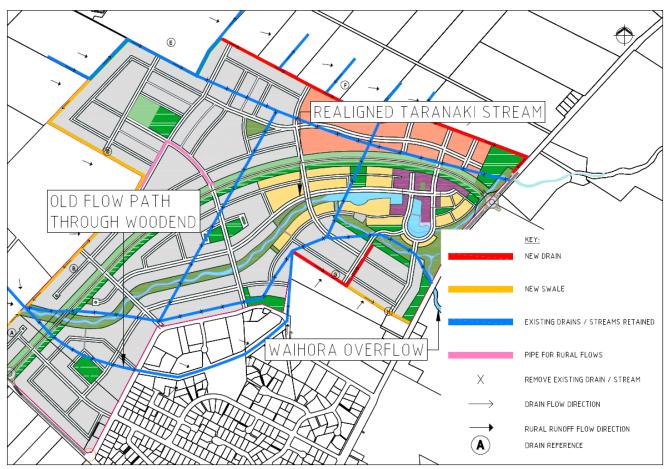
Existing Drainage Network and Proposed Stream Alignment.
